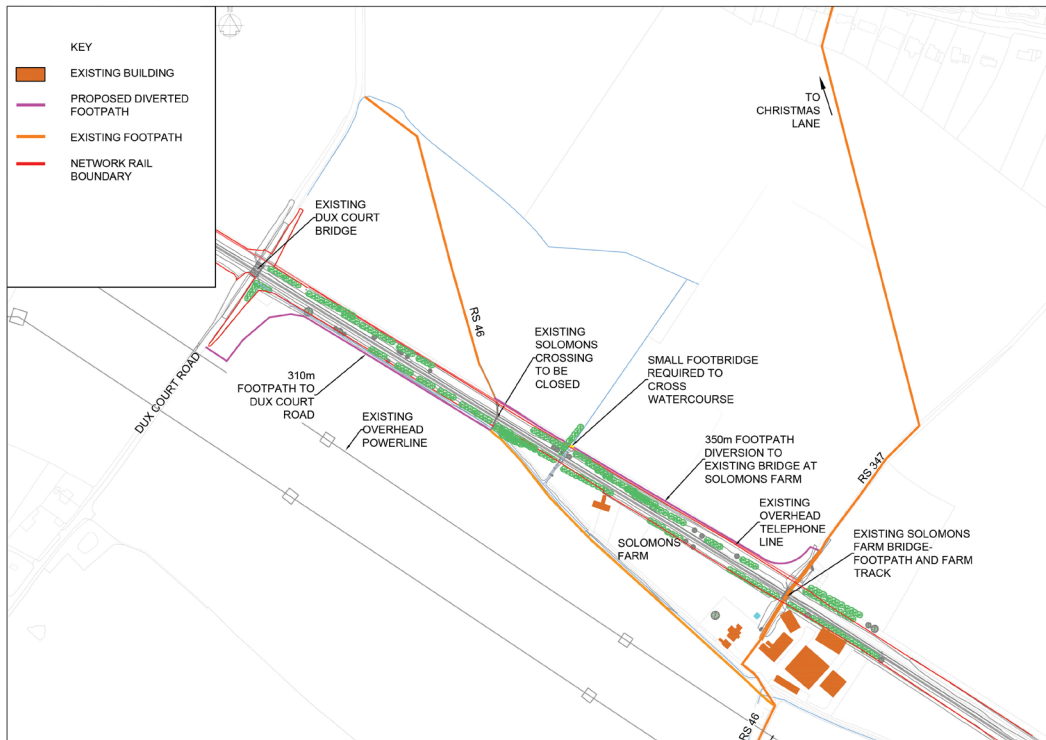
Solomons Crossing - An image showing a map with the existing and proposed crossings. The footpath crossing the track is being closed and two new footpaths are being created either side of the track to the nearest bridges.
